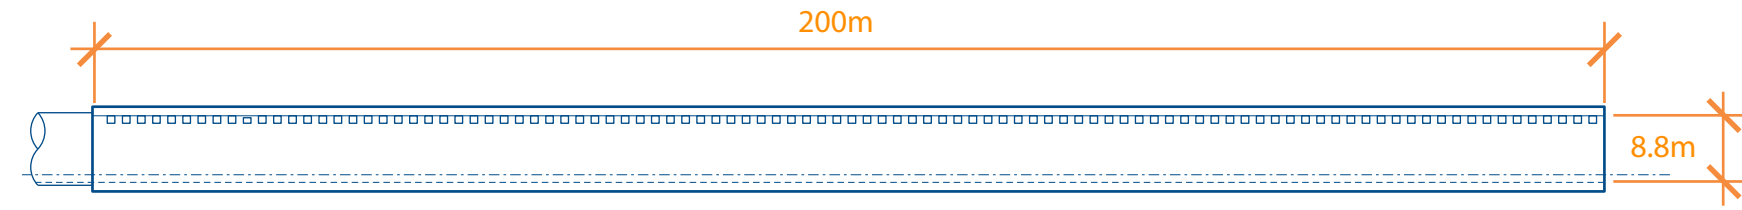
\_ Elevation - Hybrid Bill portal hood
